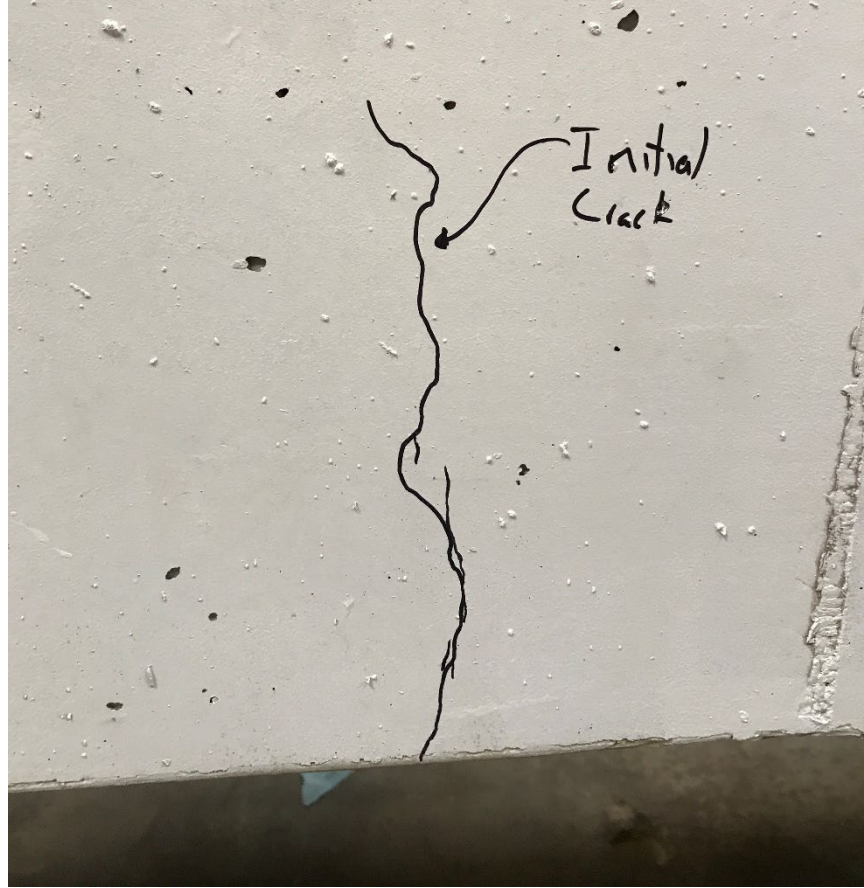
Crack Initiation Cracks in the Voided Deck Slab
